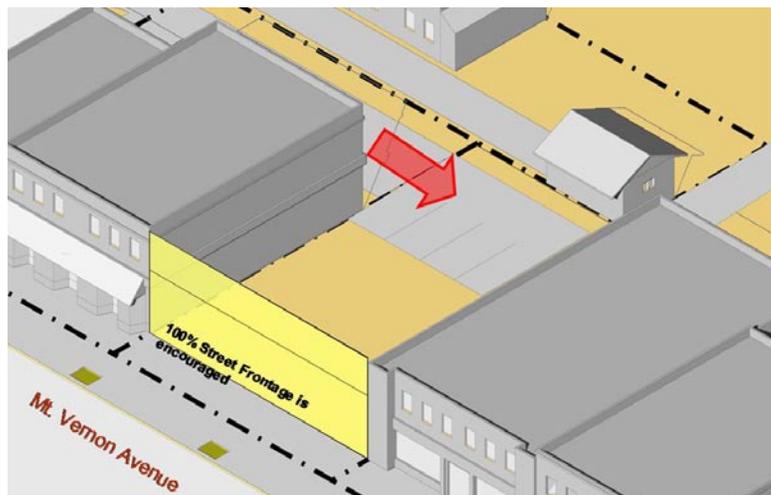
Restrict curb cuts on Mt. Vernon Avenue
